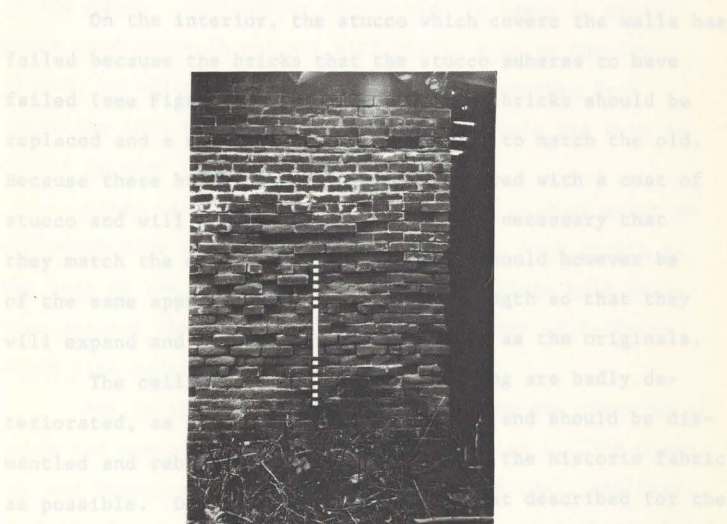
Close up of east wall shows severity of spalling.
